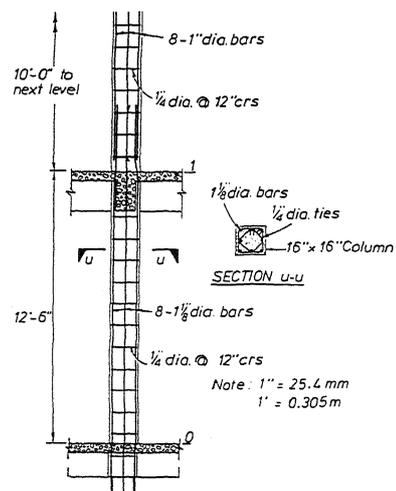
Details of reinforcement in a column of a New Zealand building frame designed in the 1950s.
